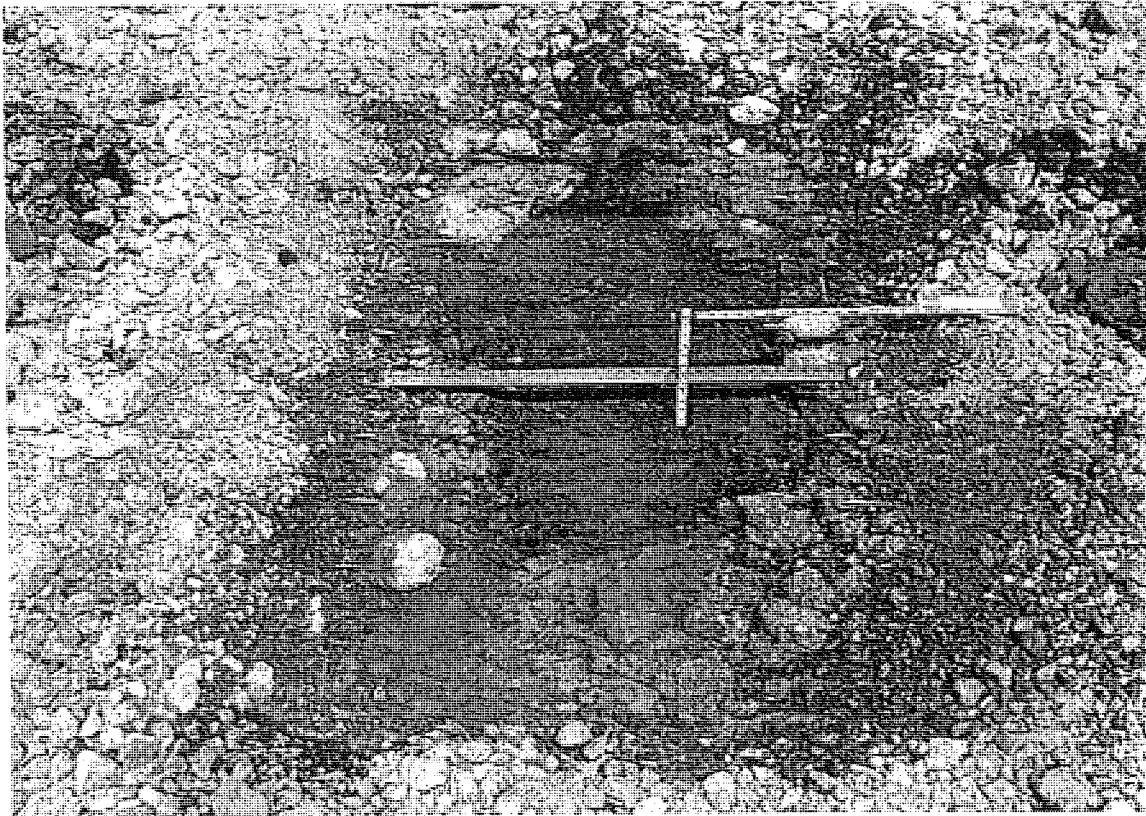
Old US-10 (North Bradley) trench in rubble concrete (station 25+064)
